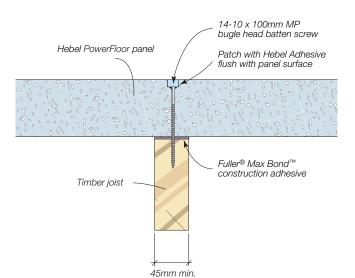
Fixing at End of Hebel PowerFloor Panel to Timber Joists
